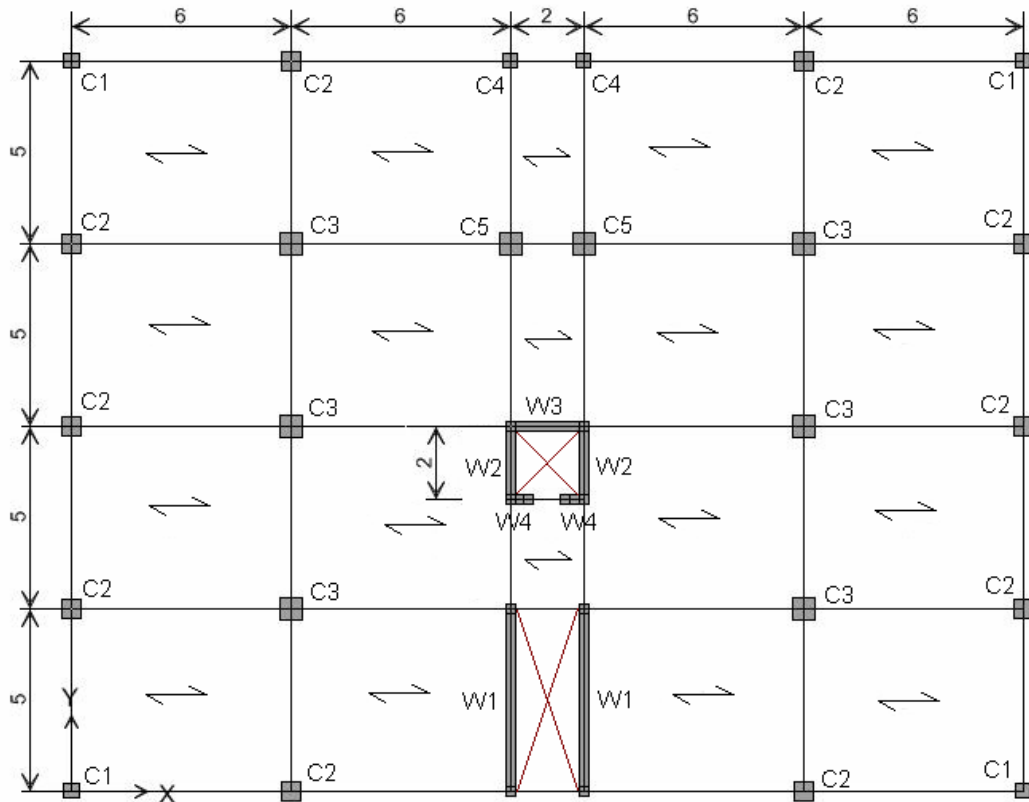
Plan layout for Model # 5 (F7RC)
